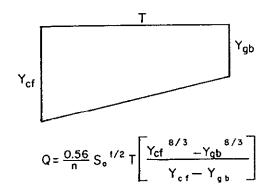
COMPOSITE GUTTER SECTIONS
